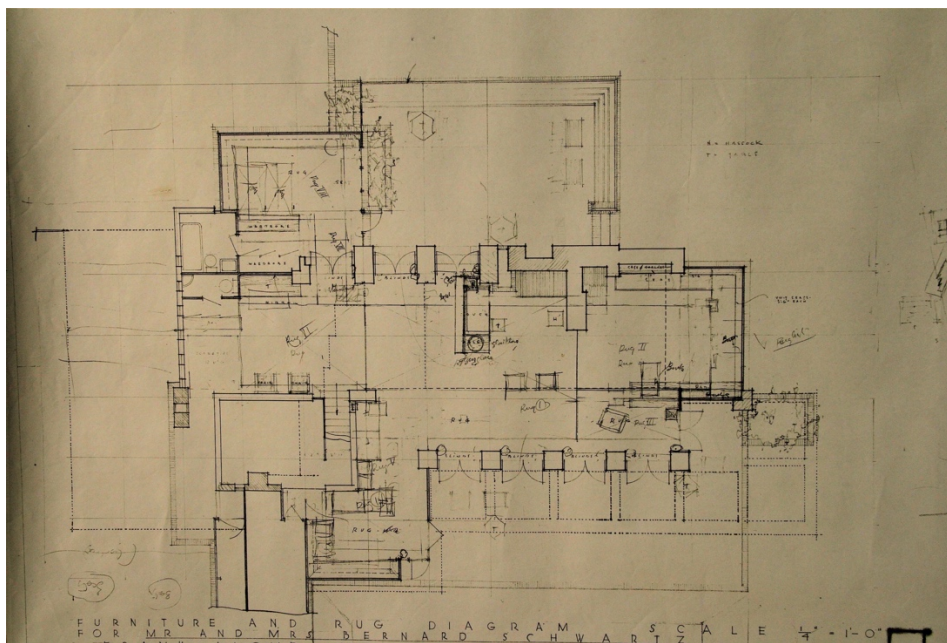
Actual floor plan as built for the Schwartz residence (courtesy Michael Dittmer).
